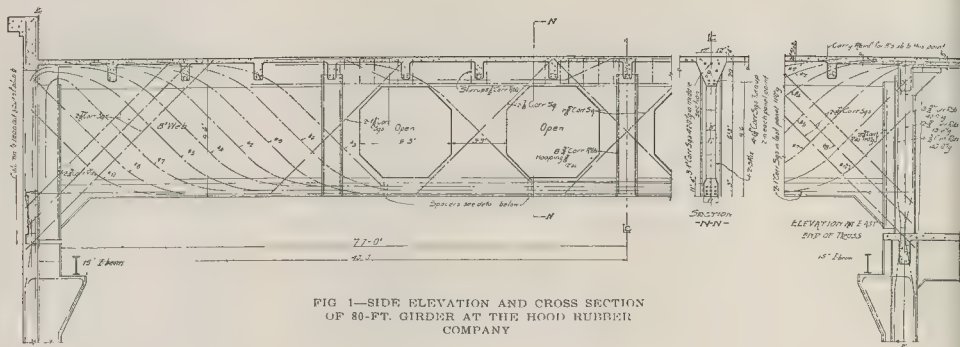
SIDE ELEVATION AND CROSS SECTION OF 80-FT. GIRDER AT THE HOOD RUBBER COMPANY
